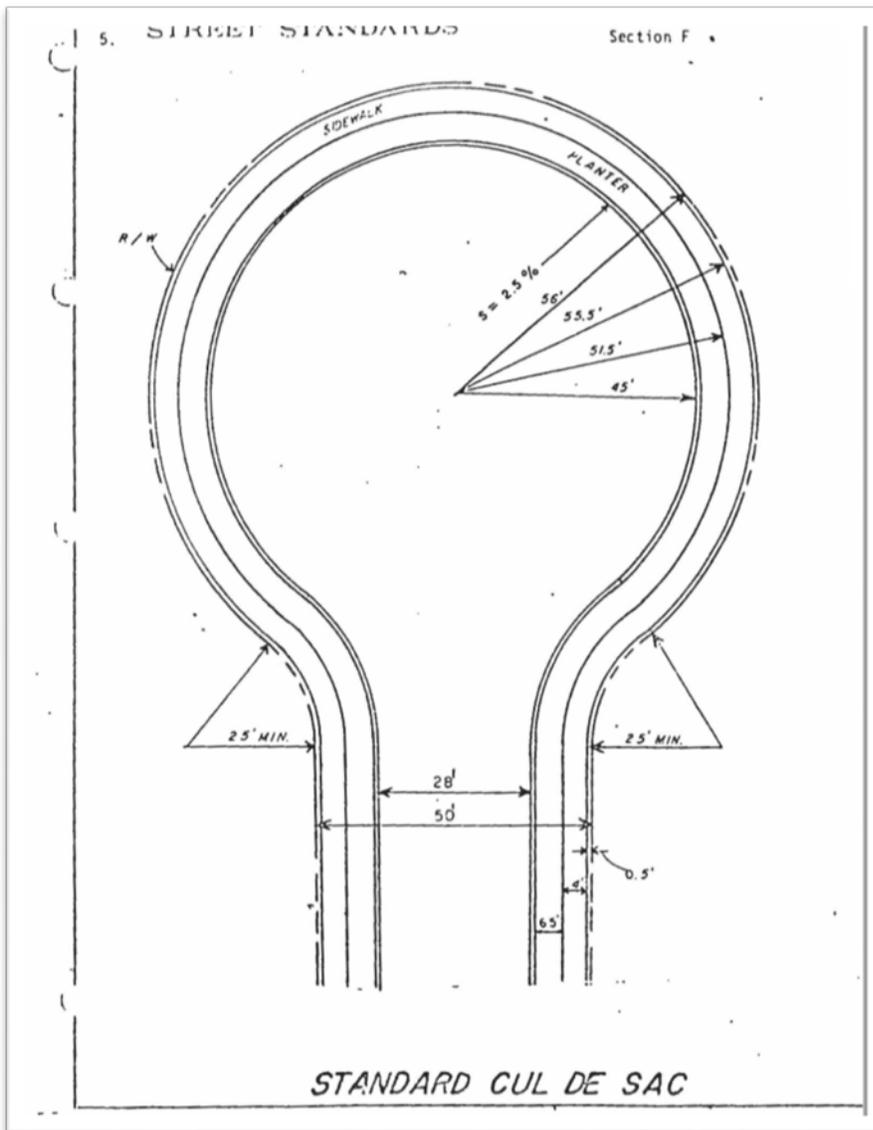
Independence Comprehensive Plan Cul-de-sac Street Cross Section
